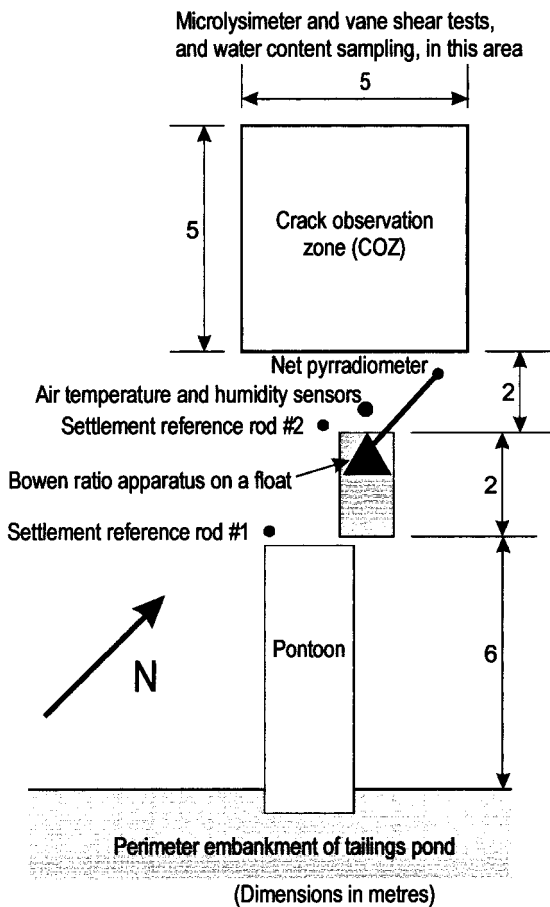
Schematic Plan View of Arrangement at Test Site in Pond #9
